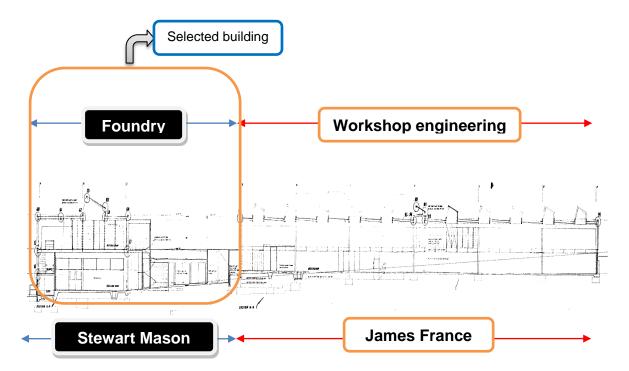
Cross-sectional view of foundry and workshop engineering (1957)
